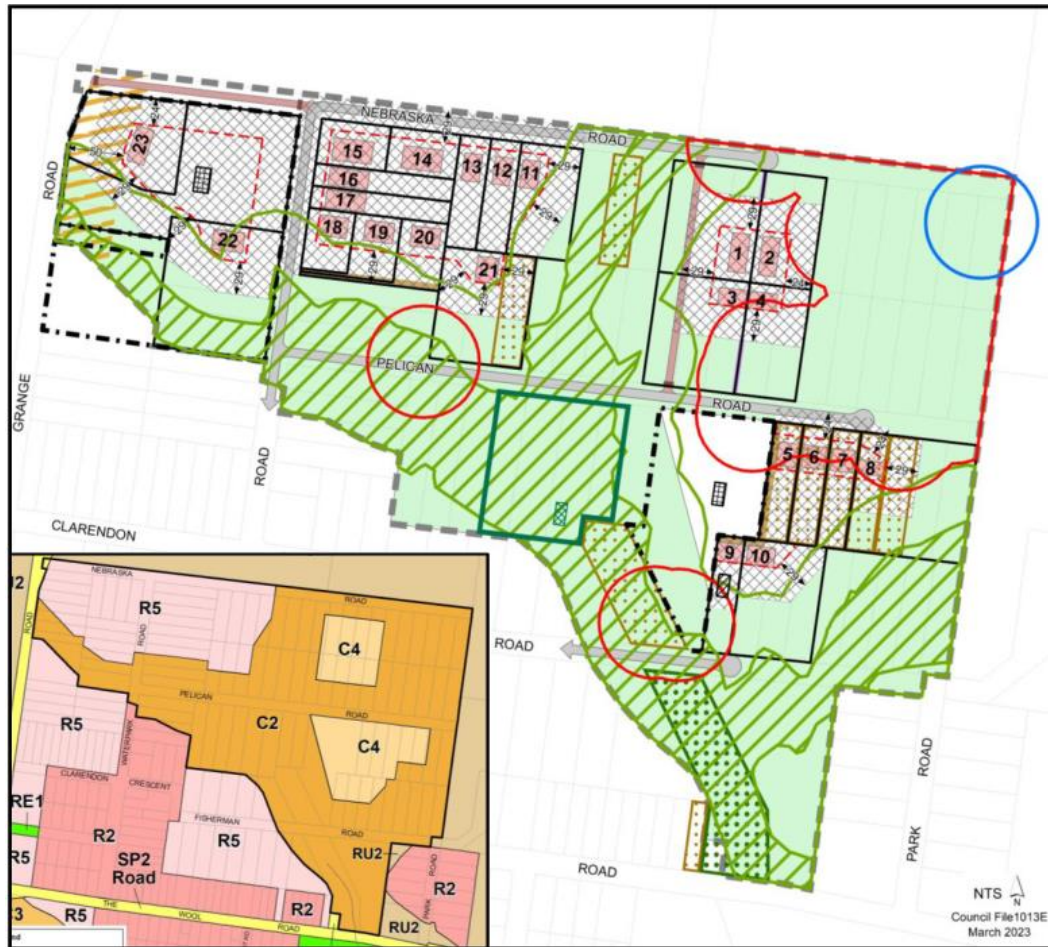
Option 1 concept plan (main) and zoning (inset) – 23 dwellings
